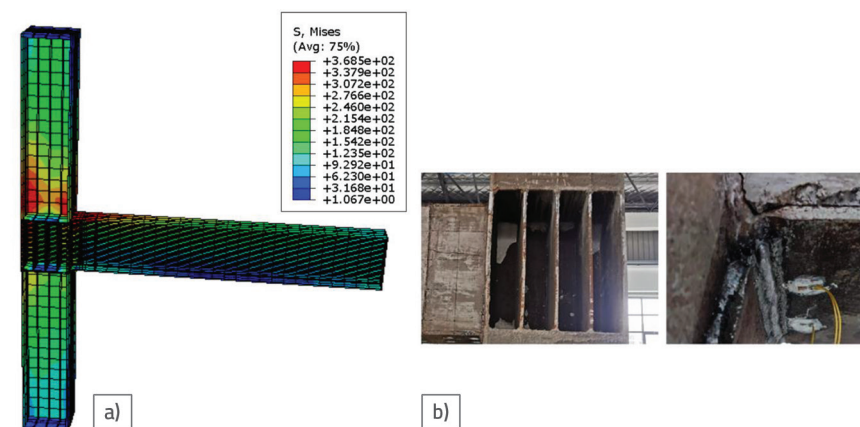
Failure pattern comparison of steel section: a) Concrete stress map; b) Actual concrete damage patterns and locations
